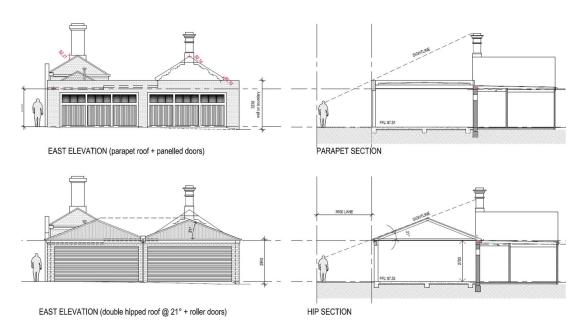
Proposed Garage, parapet, and hipped roof options. sightlines from the 3.6m wide lane shows that the hipped roof option provides greater visibility of the extant buildings.
